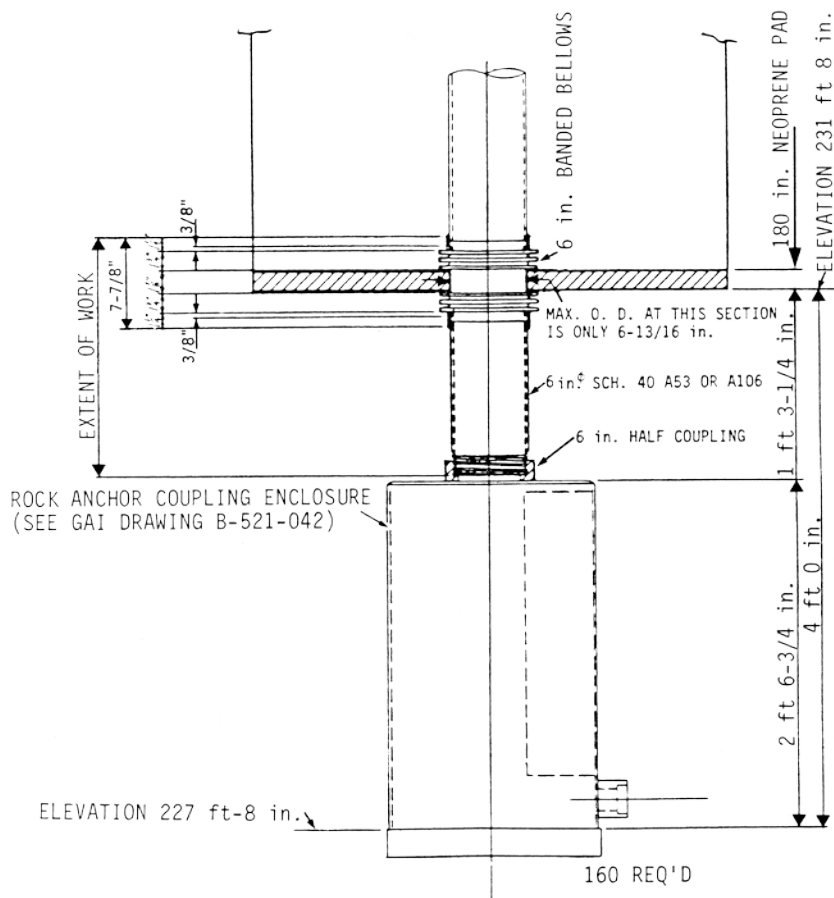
Containment Miscellaneous Steel Tendon Conduit - Hinge Detail
